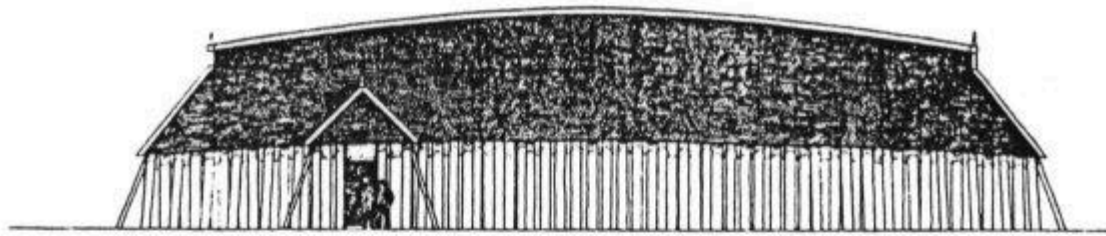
DRAWINGS OF THE RECONSTRUCTED VIKING HOUSE AT FYRKAT (AFTER SCHMIDT 1981)
